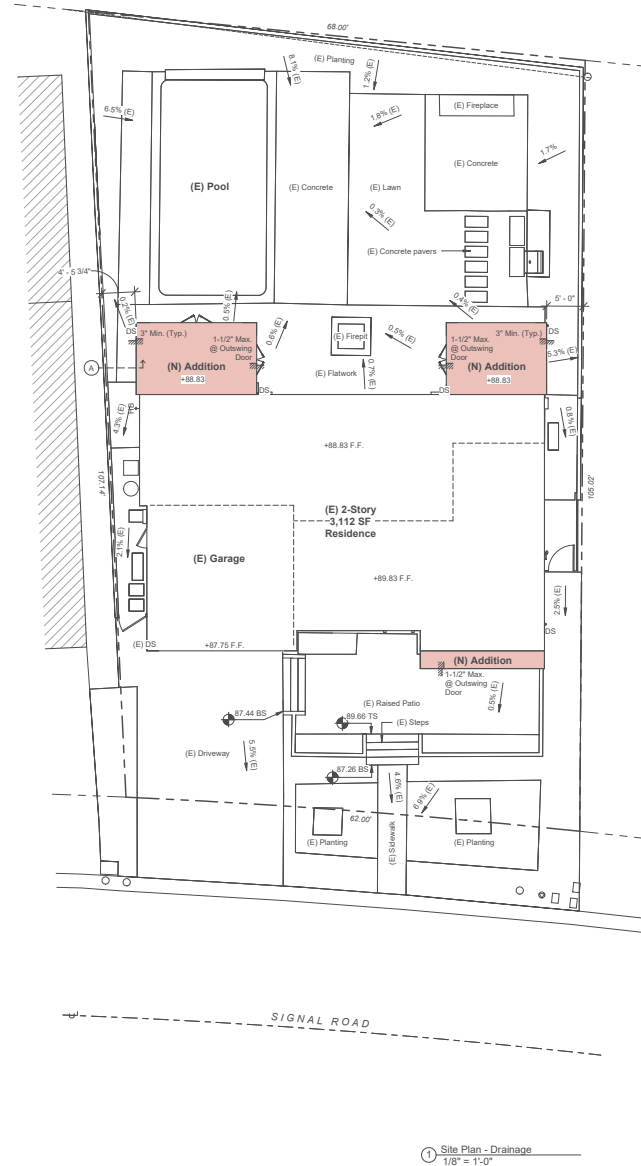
DETAILS - FROM NB STANDARD RESIDENTIAL MINOR DRAINAGE ALTERATION PLAN SHEET
